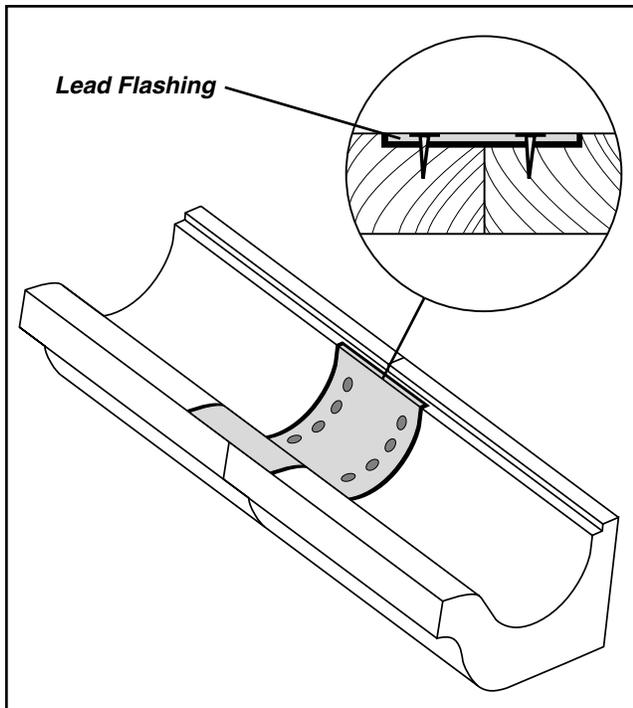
Gutter Joint Showing Traditional Lead Web Set in Asphalt Flashing Cement
